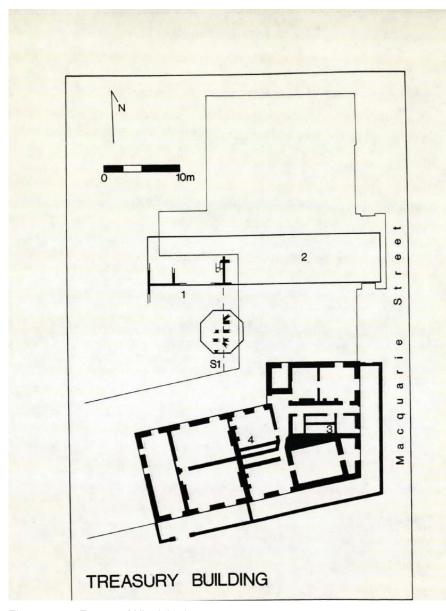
The Treasury Building, Macquarie and Bridge Streets, Sydney. Site plan showing areas of archaeological interest, as follows: 1. Stables (1851-1853) and courtyard, with toilet block (by 1872); 2. Land sale room (1851-1853); 3 and 4. Cavities under main staircase and under hallway (S1 section 1, illustrated in figure 2). The original offices and out-buildings are shown in heavy outline, along with the present room plan of the basement for the former. The remains of walling for the stables and toilet block were discovered during the archaeological investigation. The extent of buildings in 1982 is illustrated in light outline.
